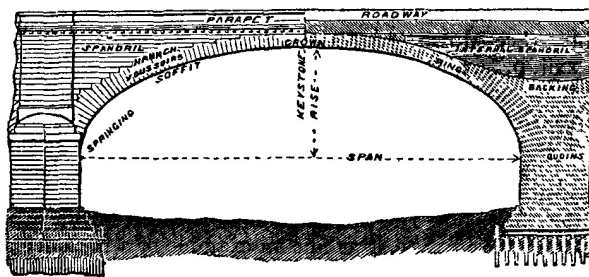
Half Elevation and Half Section of Arch of London Bridge.
